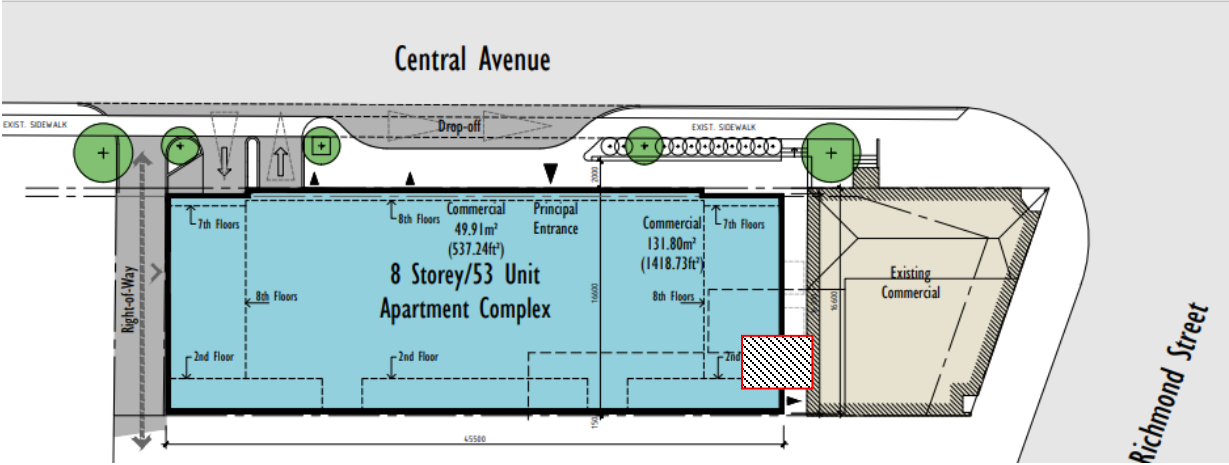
Site plan indicating area of original building fabric c.1892 that could be retained as an alternative development option (Source: R. Tomè and Associate, 2020)
